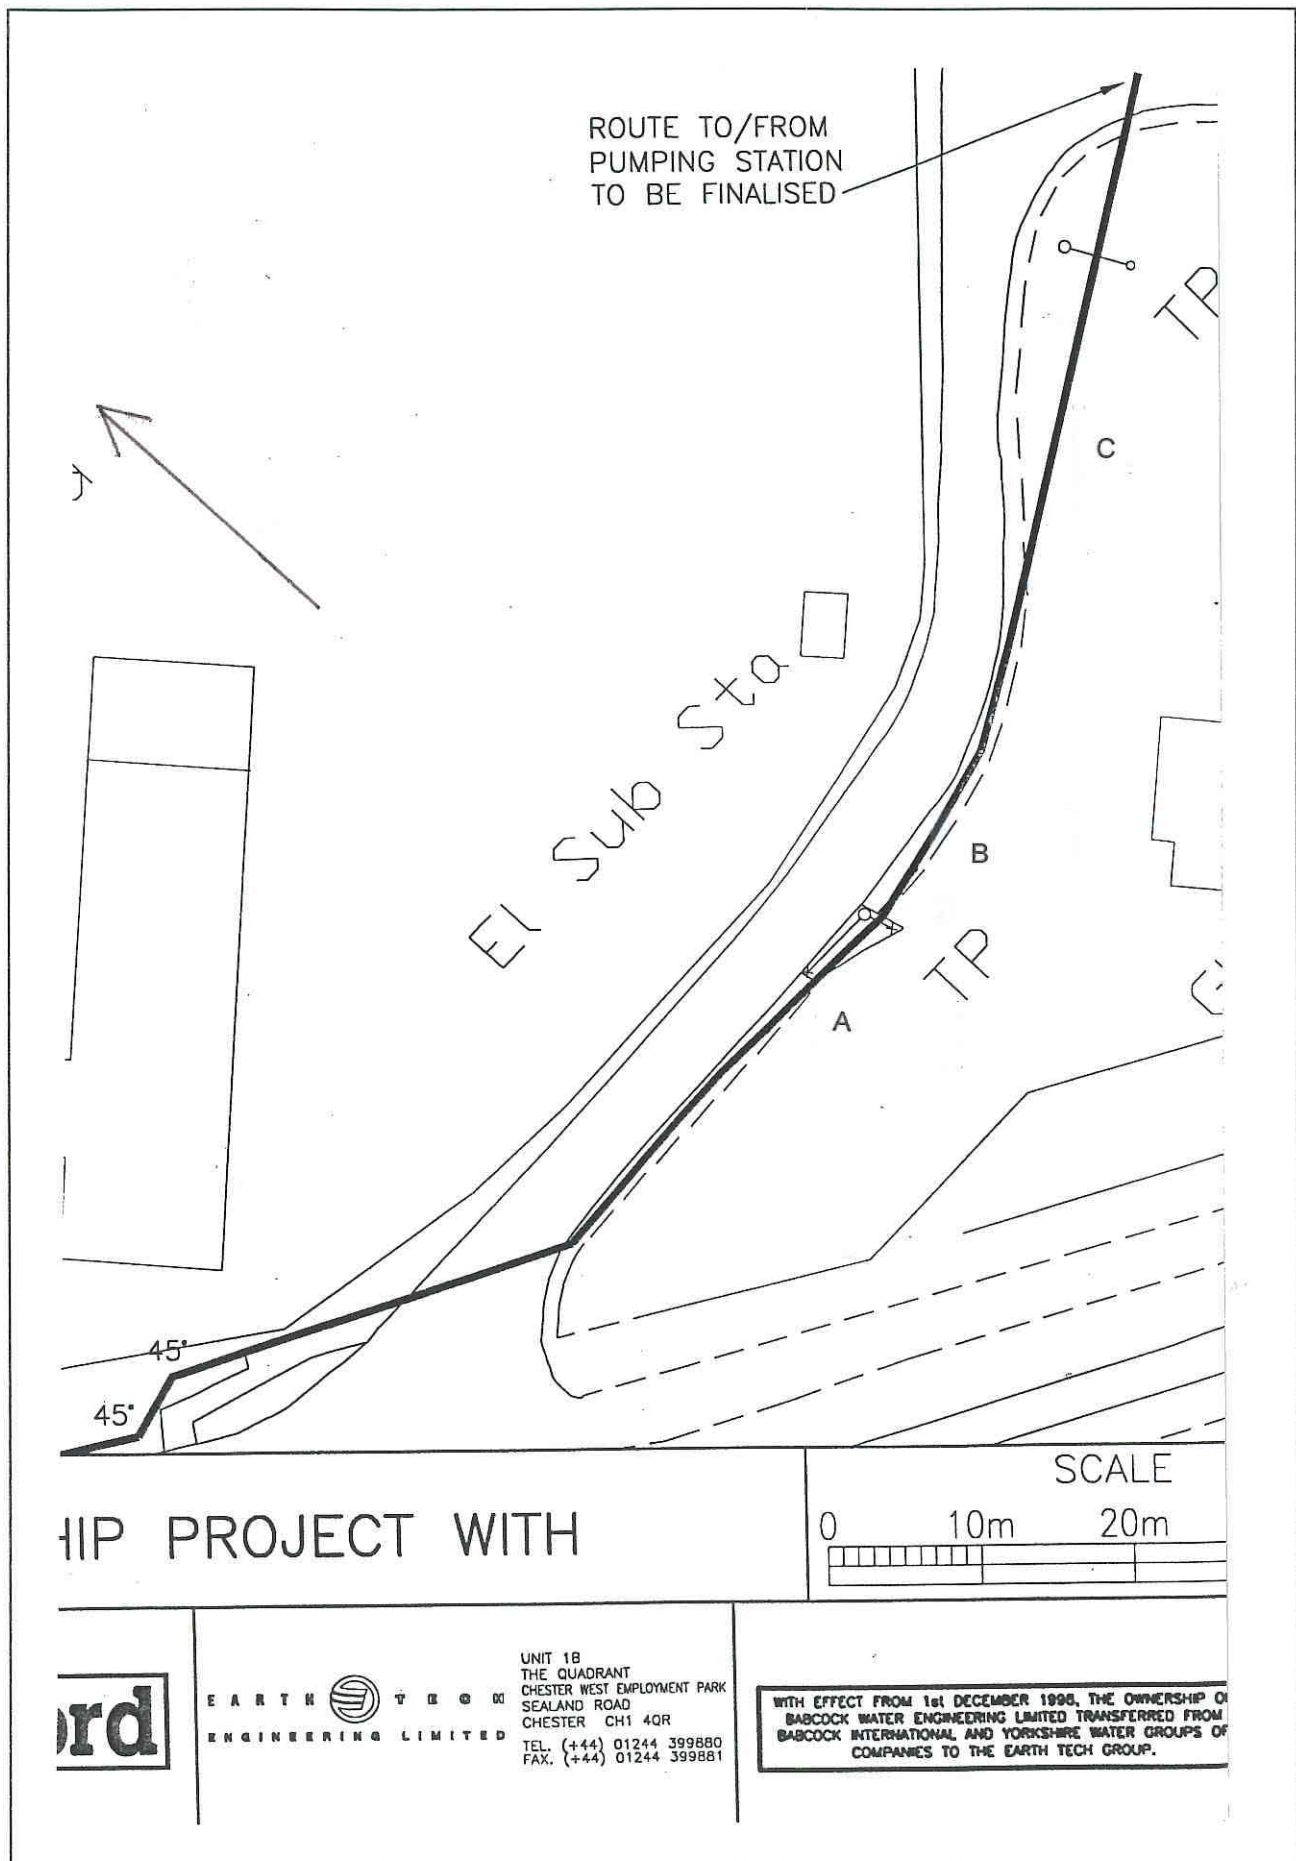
Watching brief adjacent to Station Road, Bagillt, scale 1:500 (reproduced with permission from Earth Tech Engineering Ltd).
